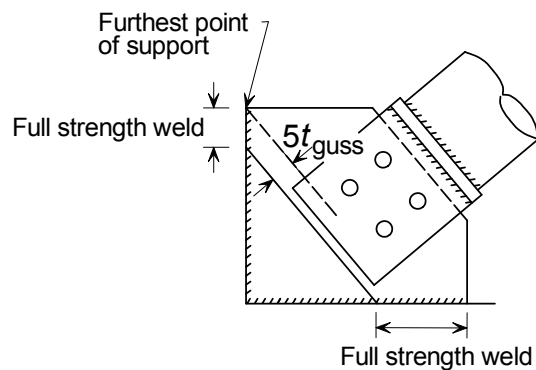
Extent of full strength welding – gusset plates supported on two edges.
